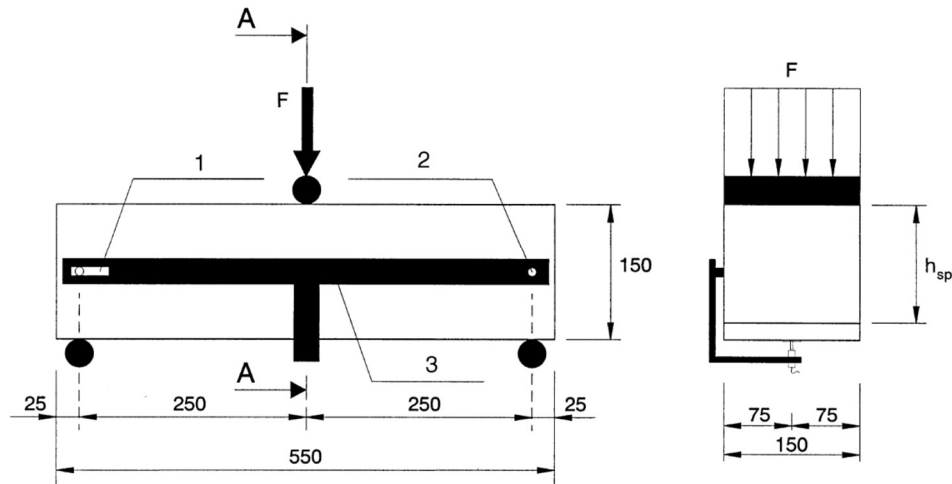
Test set-up when the displacement is measured: 1) sliding fixture; 2) rotating fixture; 3) rigid frame
